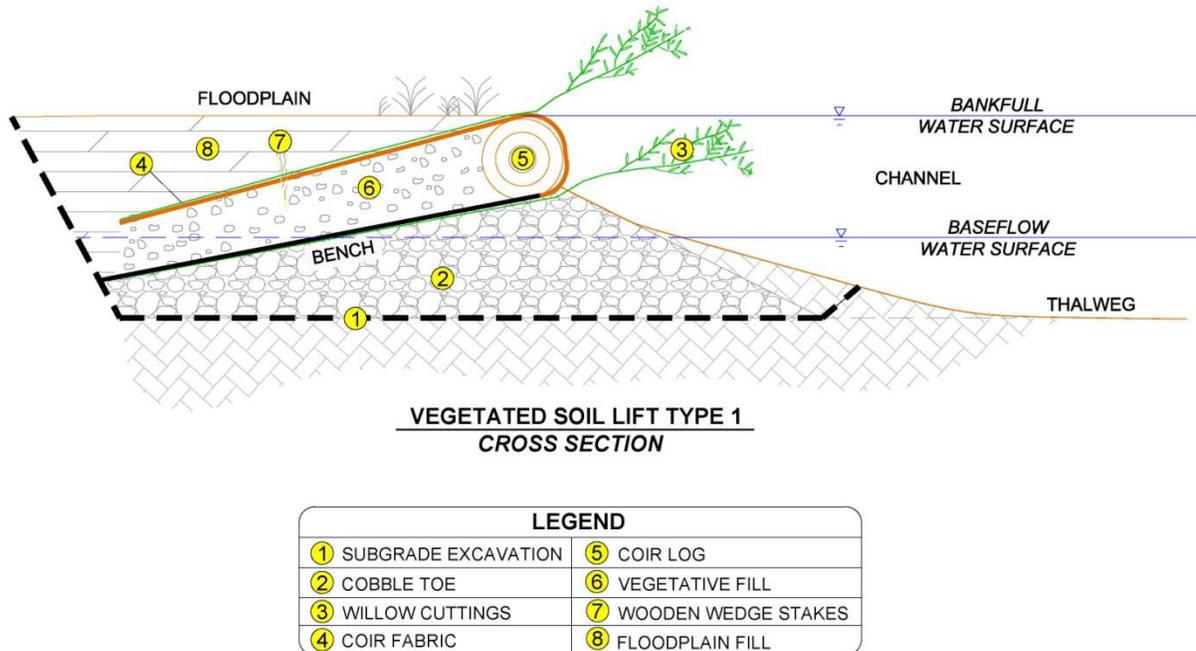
Conceptual cross section of a vegetated soil lift bioengineering treatment.
